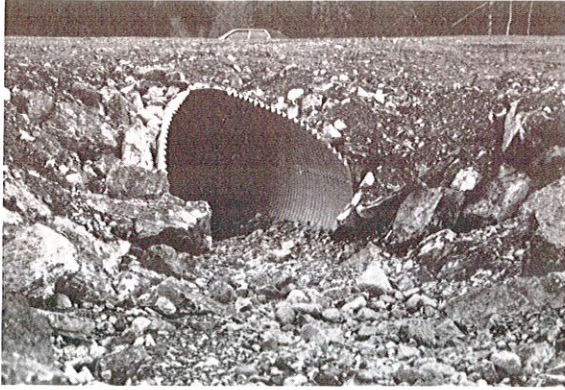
PROPERLY-INSTALLED CULVERT. This culvert has been placed below grade and large rock used for riprap.
